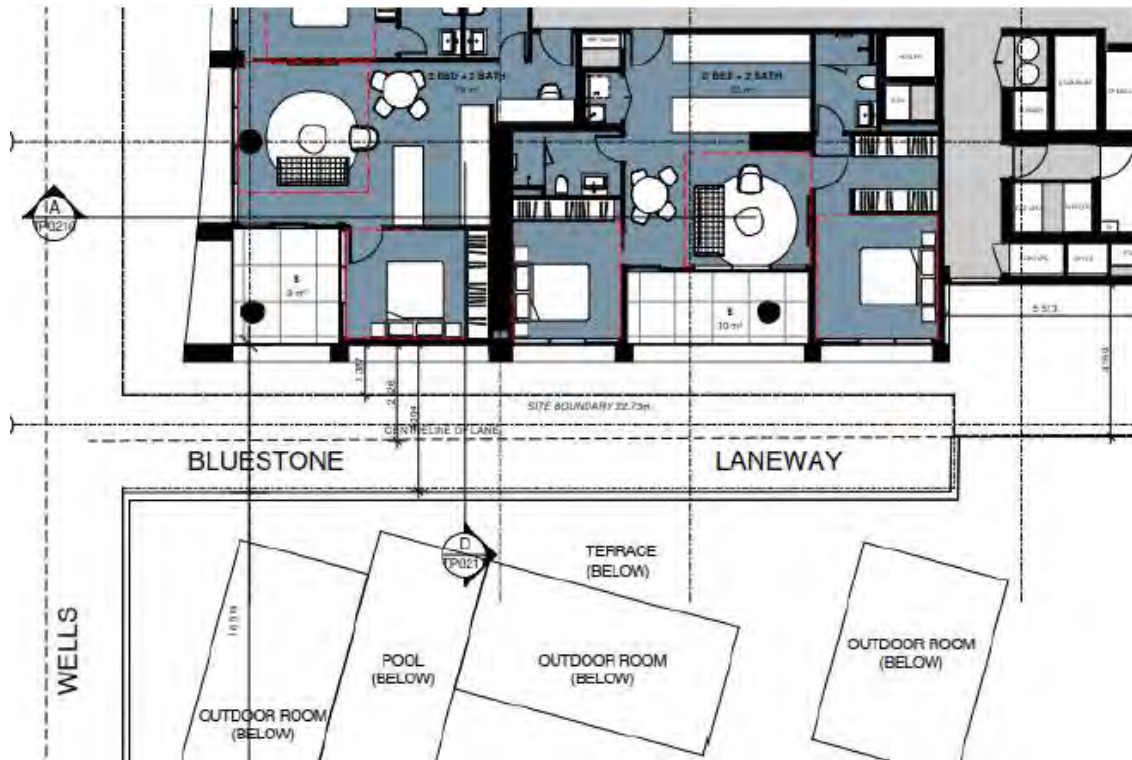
Separation distance to roof top open space at 22 Dorcas Street
